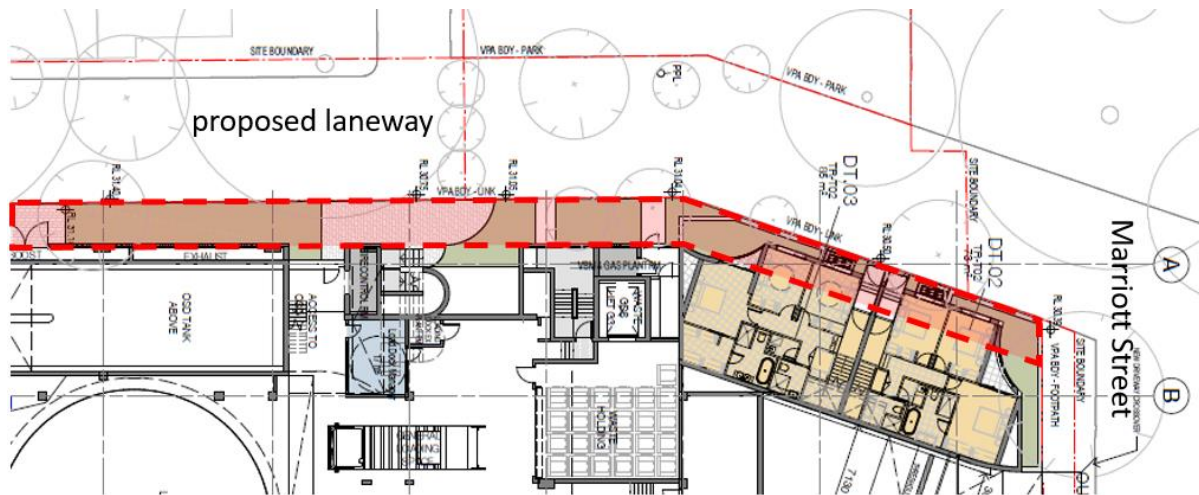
Proposed lower ground floor plan depicting the 2.5 metre required setback to the proposed laneway, with built and unbuilt areas highlighted by red dashed lines.
